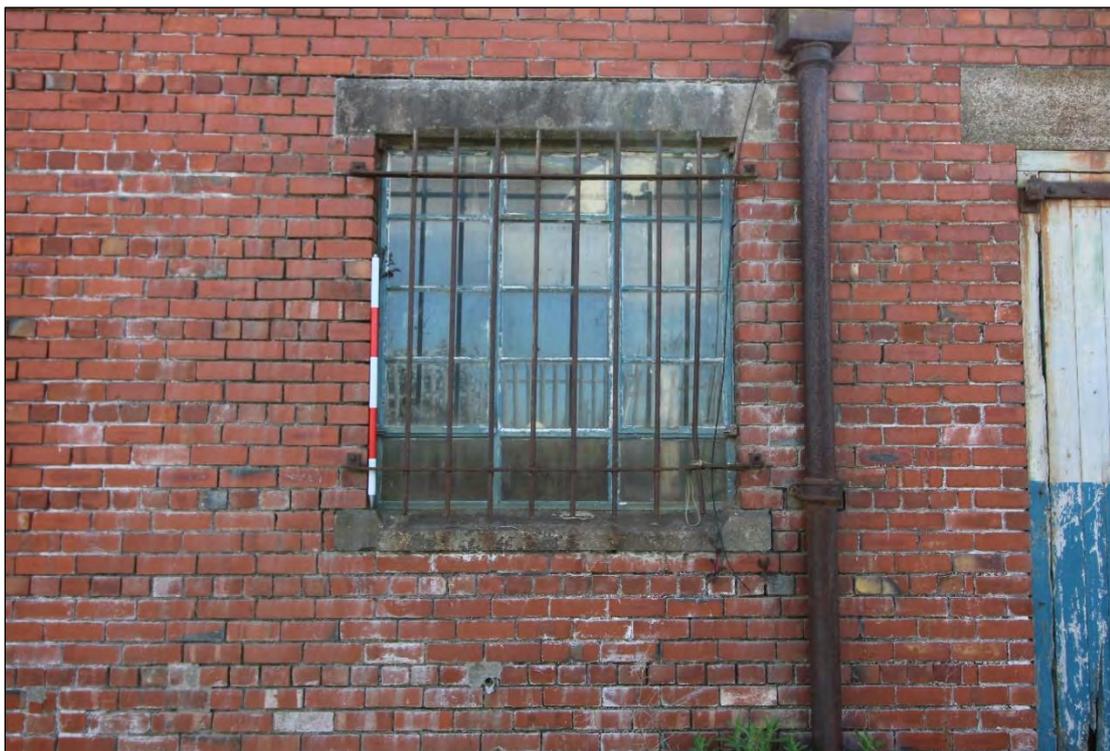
Barred window at the centre of the northern elevation, with 1m scale
